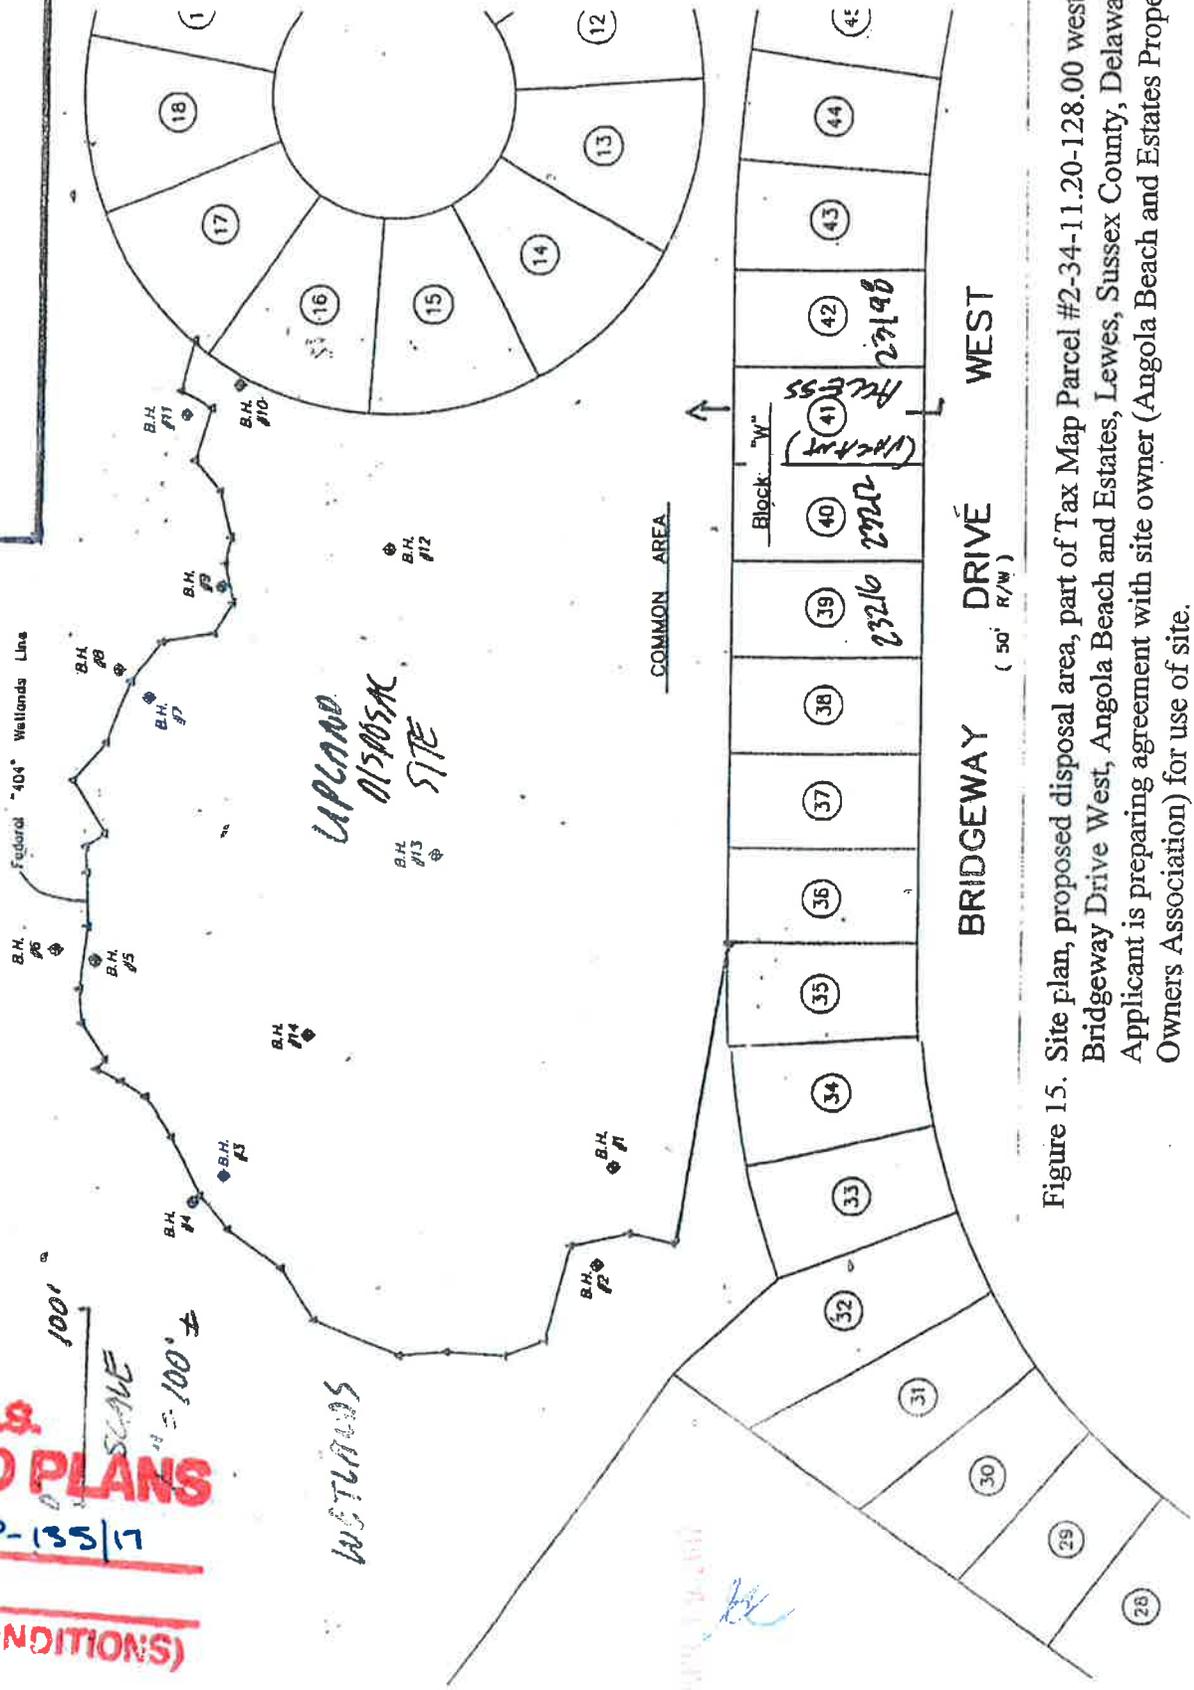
Site plan, proposed disposal area, part of Tax Map Parcel #2-34-11.20-128.00 west of Bridgeway Drive West, Angola Beach and Estates, Lewes, Sussex County, Delaware. Applicant is preparing agreement with site owner (Angola Beach and Estates Property Owners Association) for use of site.
